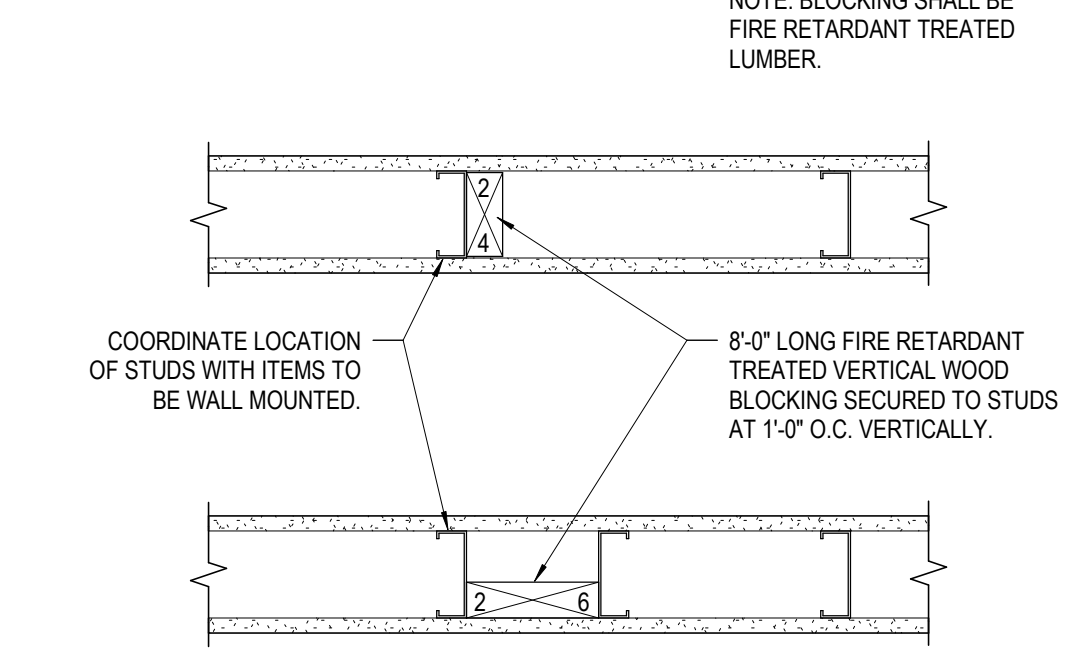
B: WOOD BLOCKING - VERTICAL / AXON
